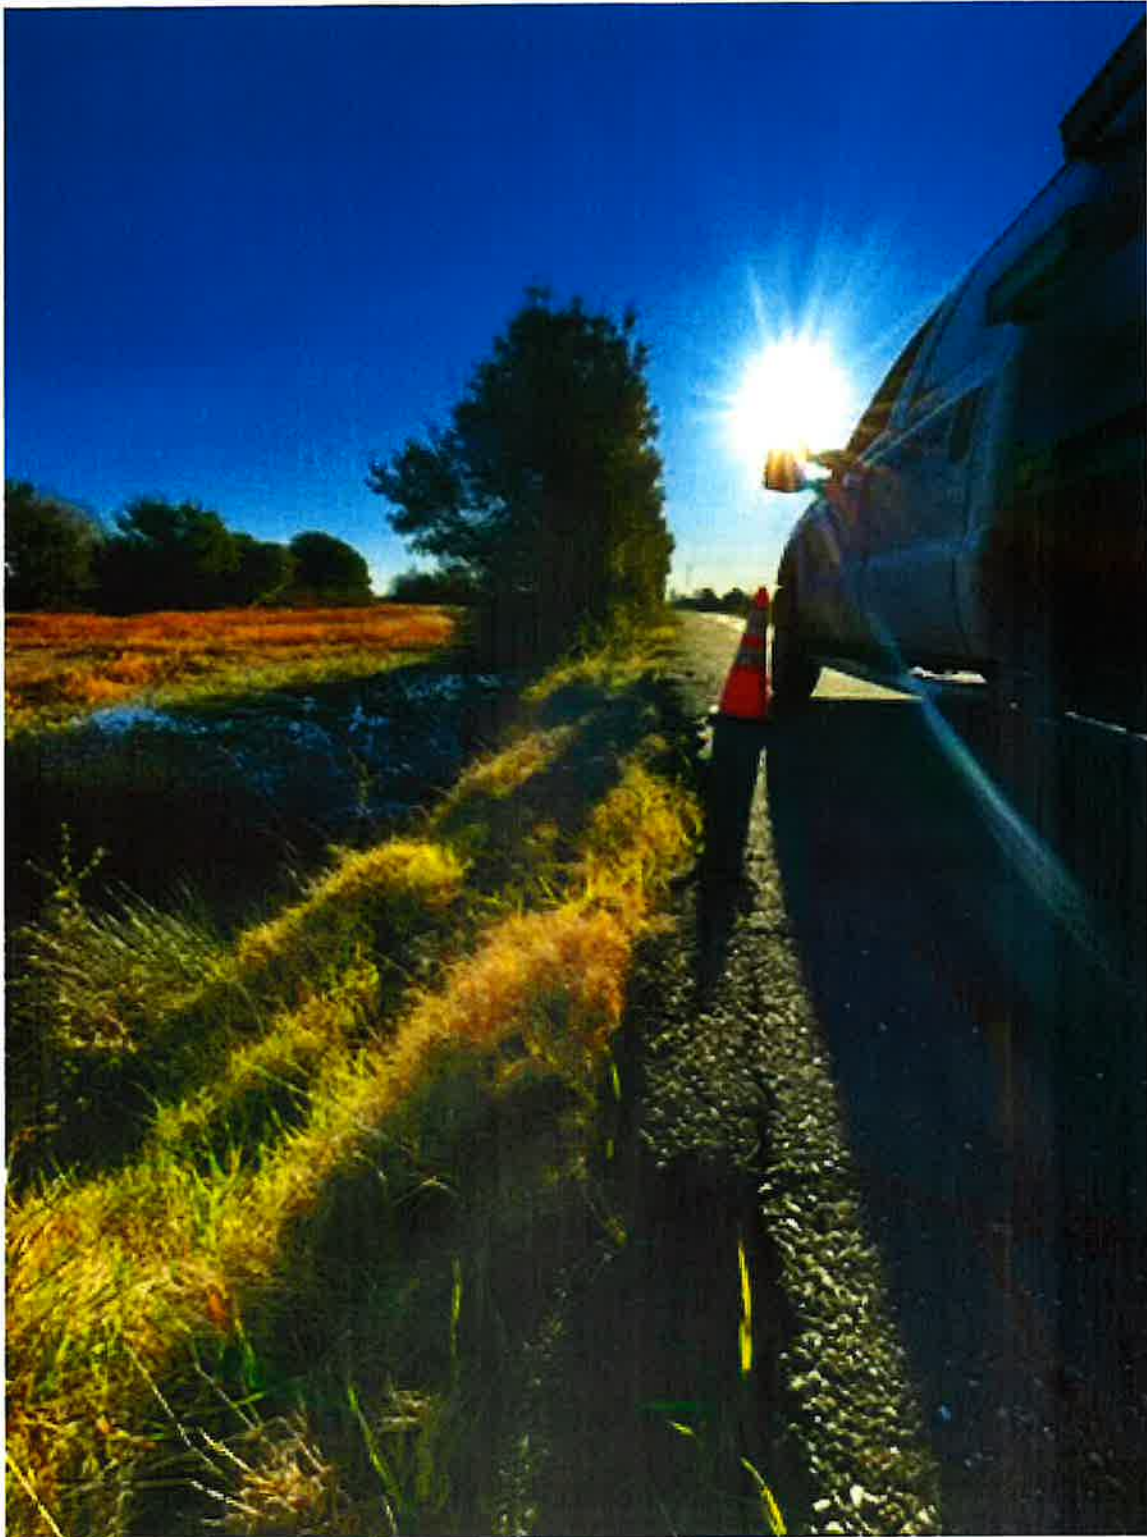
EXISTING DAMAGE SITE CONDITIONS
